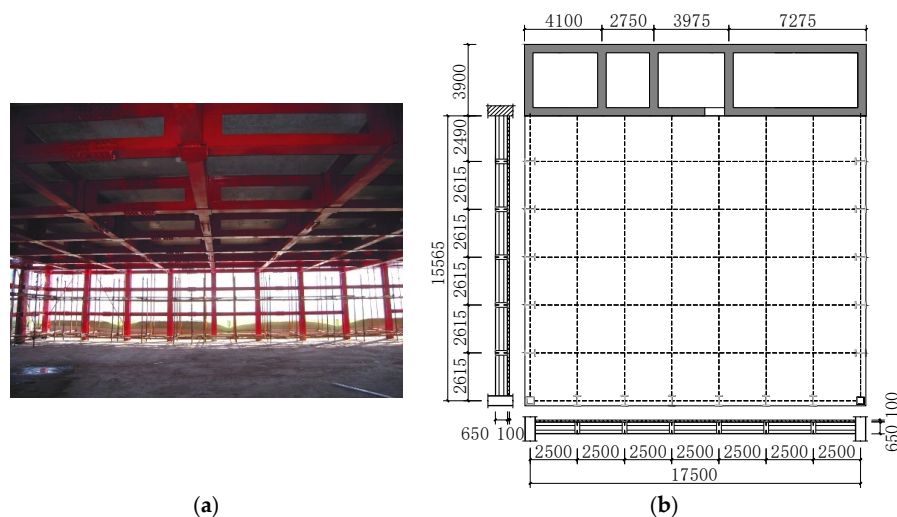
Structural diagram of the floor: (a) site photo; (b) plane layout.
